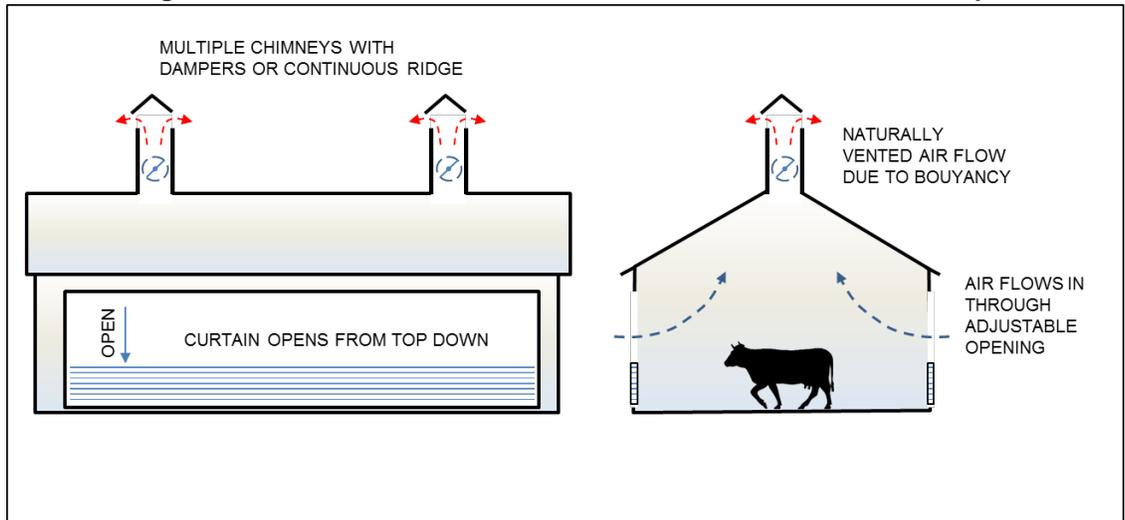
Natural Ventilation with Chimneys or Continuous Ridges Concept
